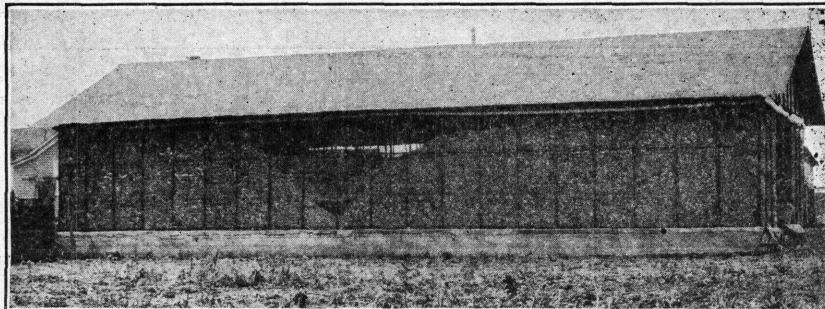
A rat and mouse proof crib having a concrete foundation, an iron frame with wire netting, and storm curtains on the sides and at the ends
